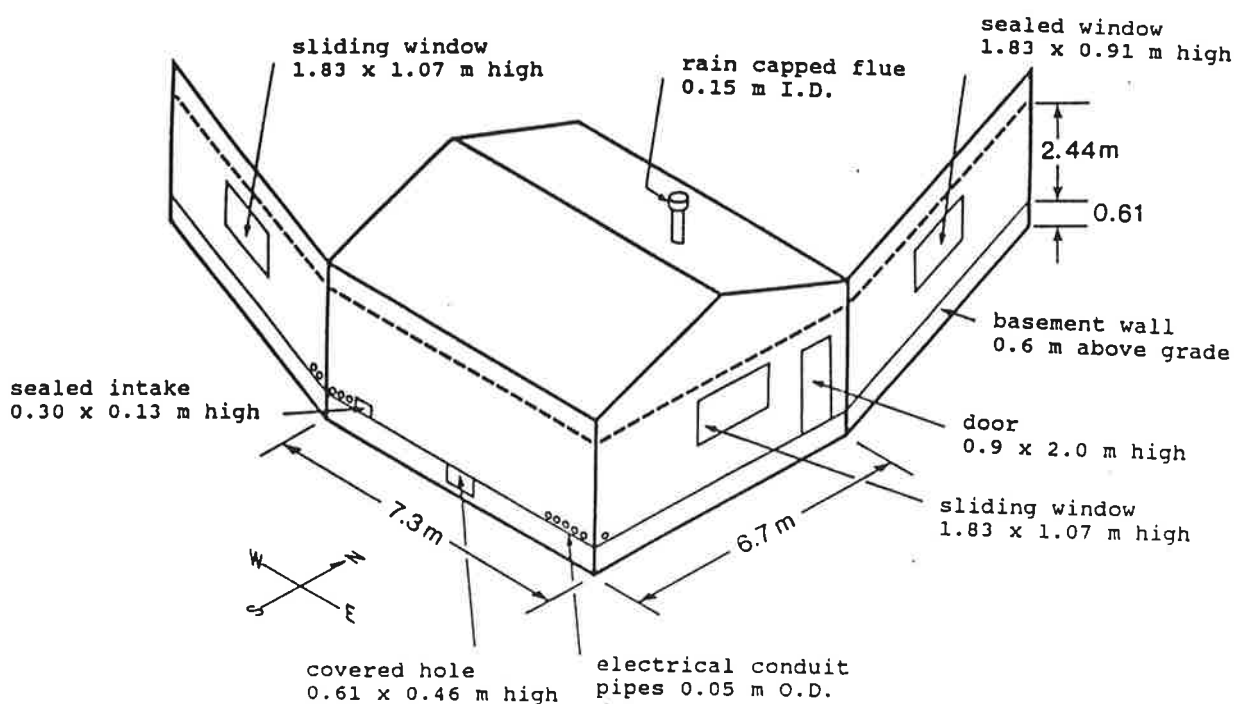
Infiltration related variables on test house 2 (overhanging roof eaves not shown)
